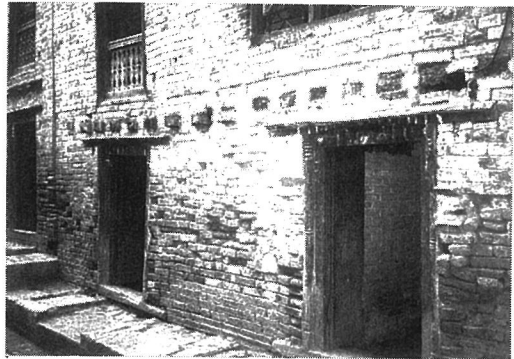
Exterior view of the floor slab system of the same brick masonry building
